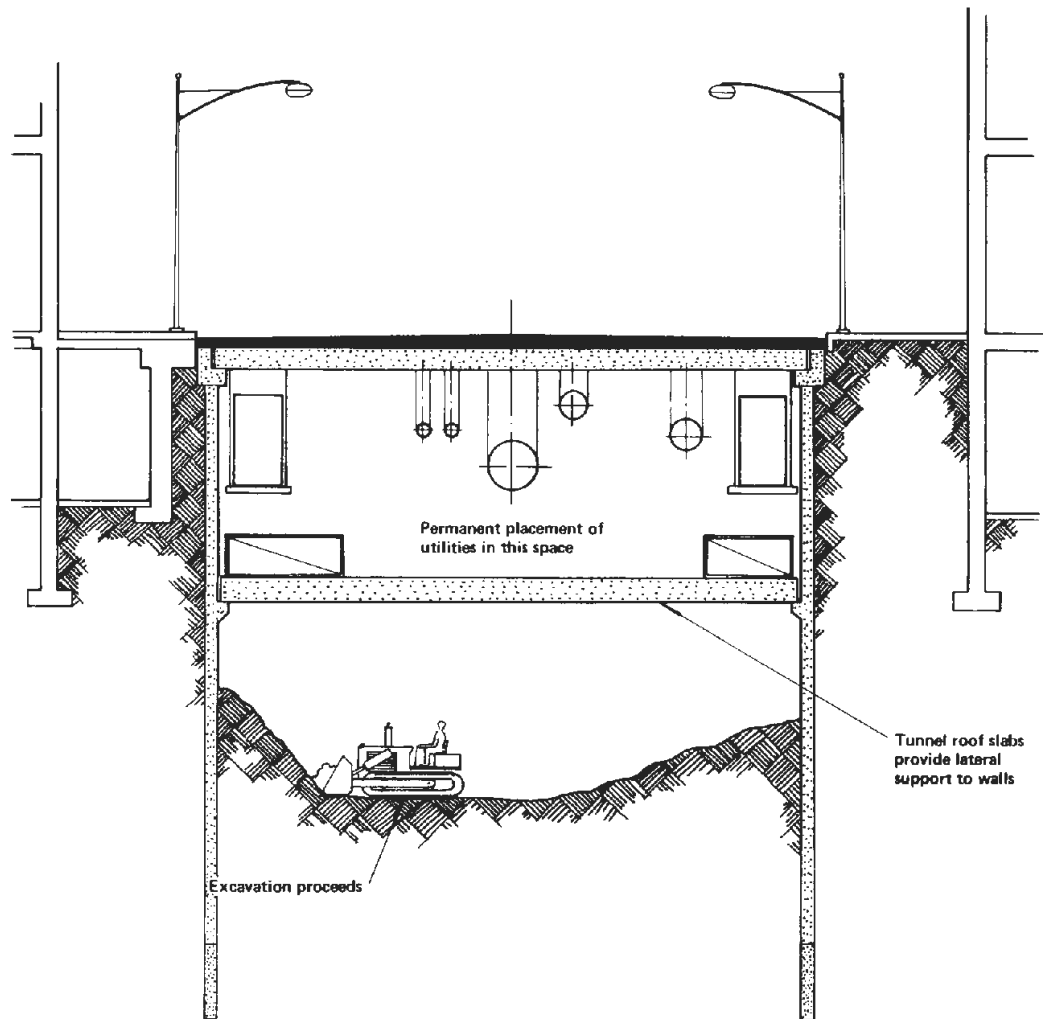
Step 13: Set tunnel roof slabs. Upper level is now available to utility companies for permanent placement of utilities in this space.
